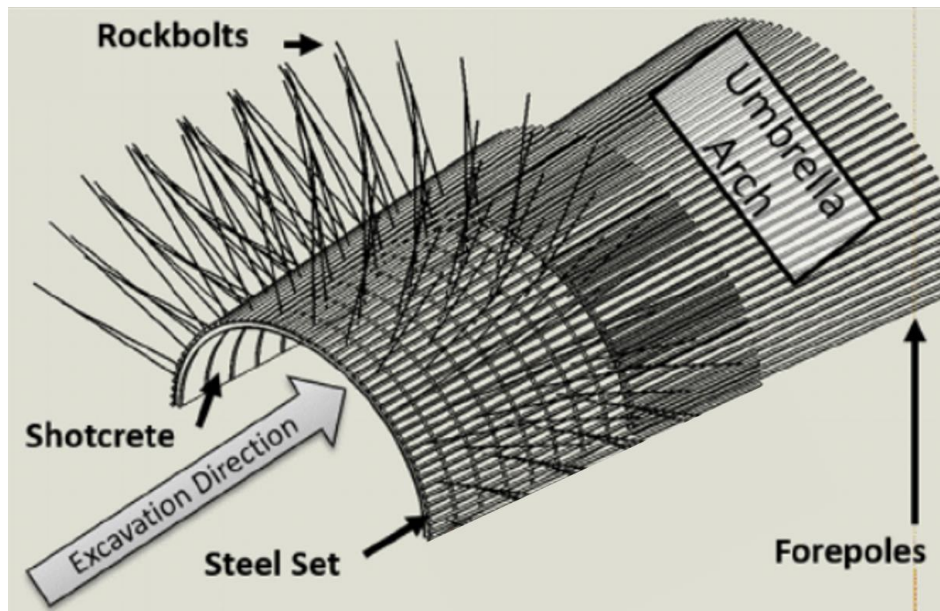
Example of support and reinforcement elements used in underground excavations (modified after Oke et al, 2014)
